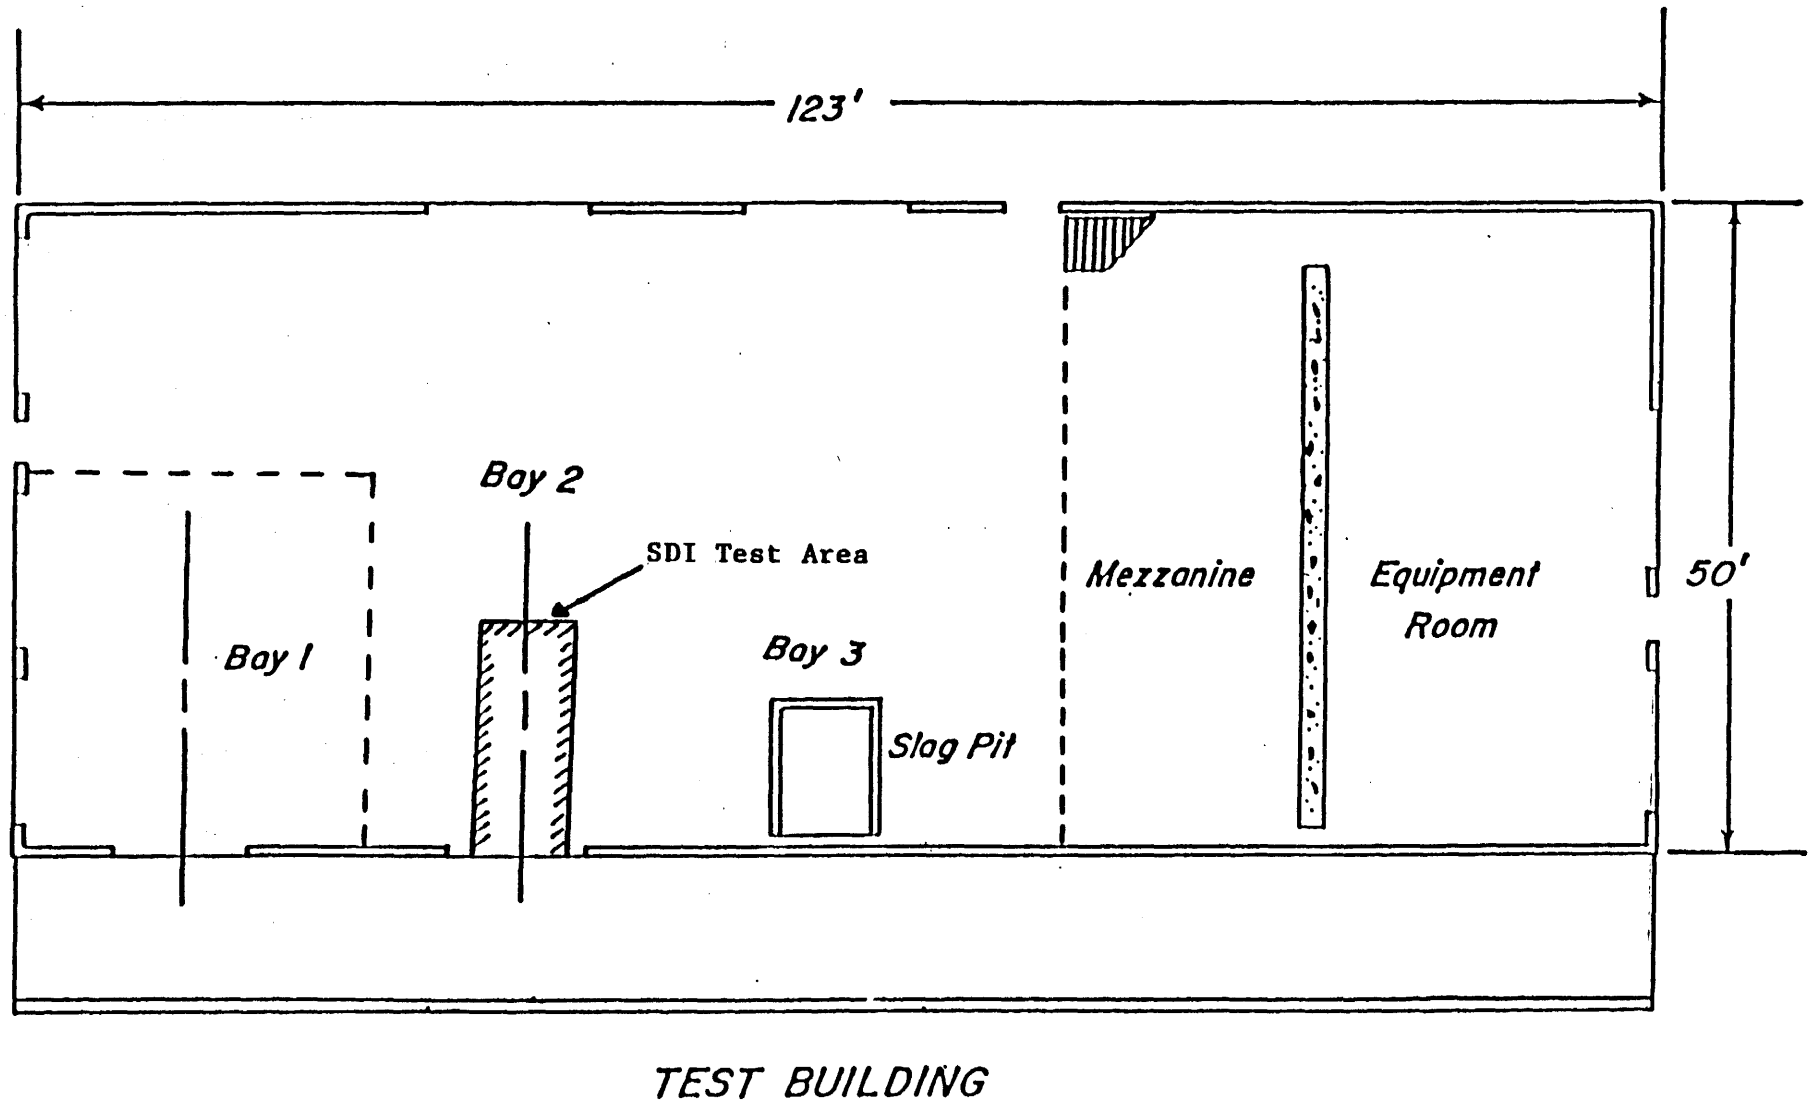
Floor Plan of Test Building Showing Location of Combustor Test Area
